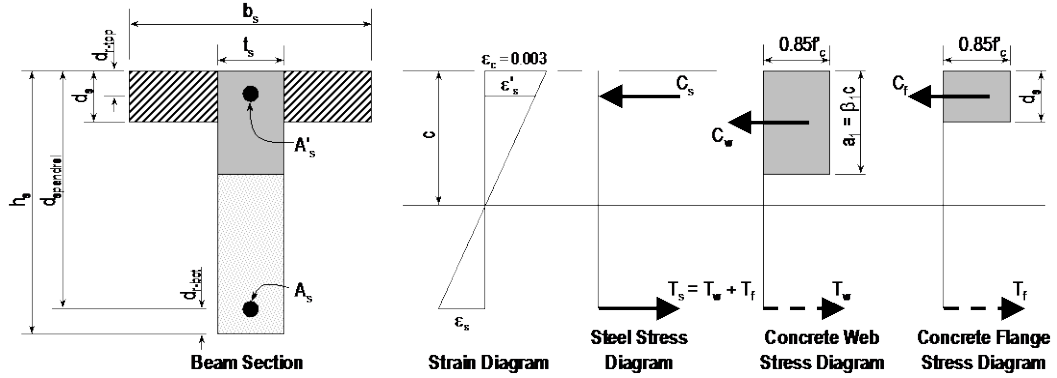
Design of a Wall Spandrel with a T-Beam Section, Positive Moment
